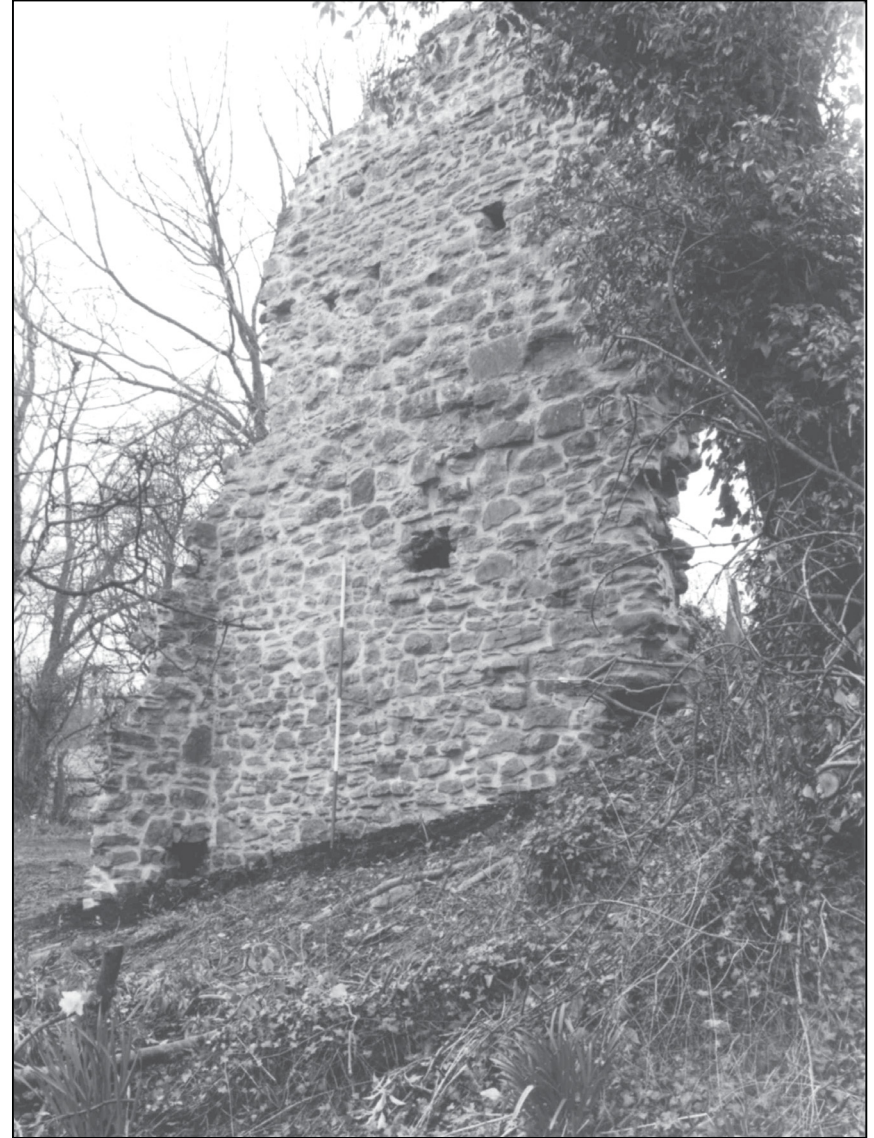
West elevation after consolidation, looking E (photo 4/6).
